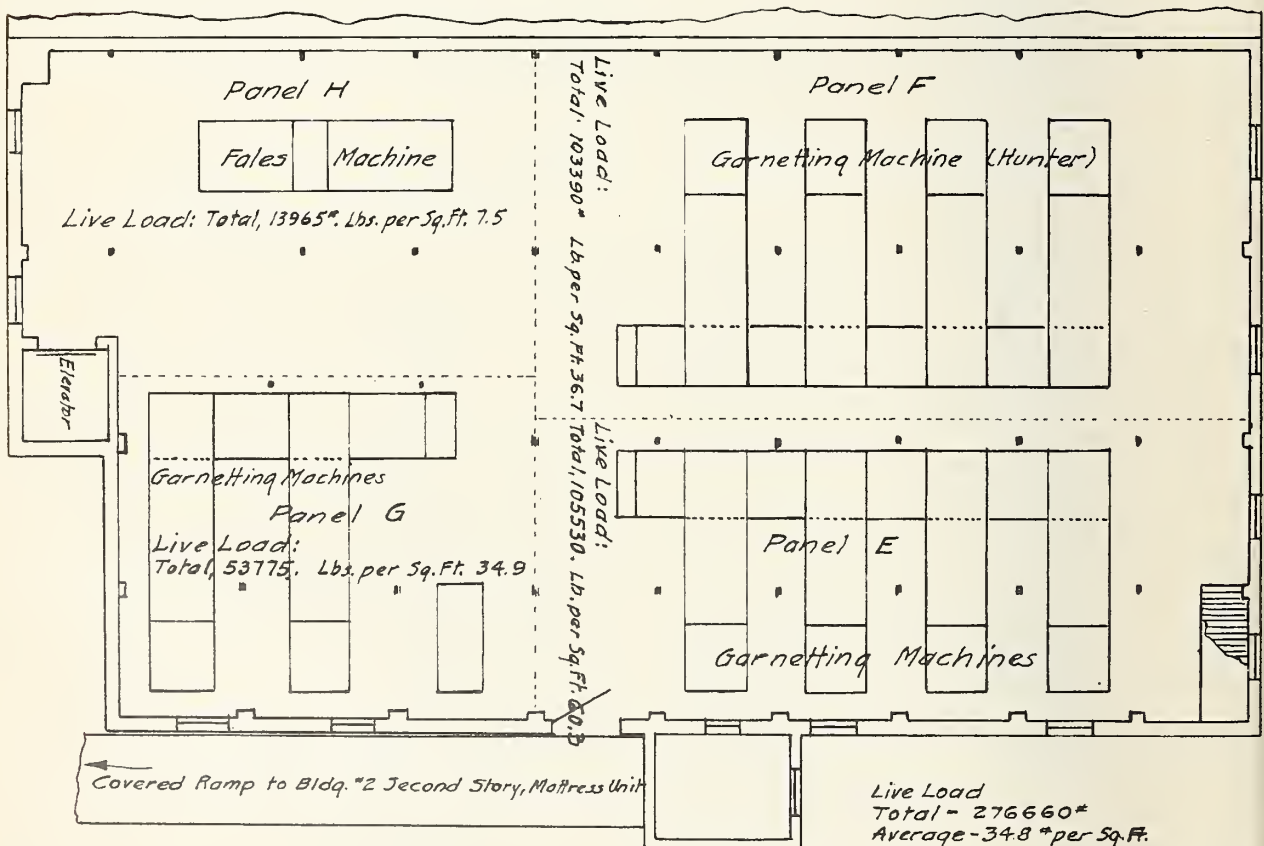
Second-floor plan, building 3, mattress factory, Chicago, Ill.
